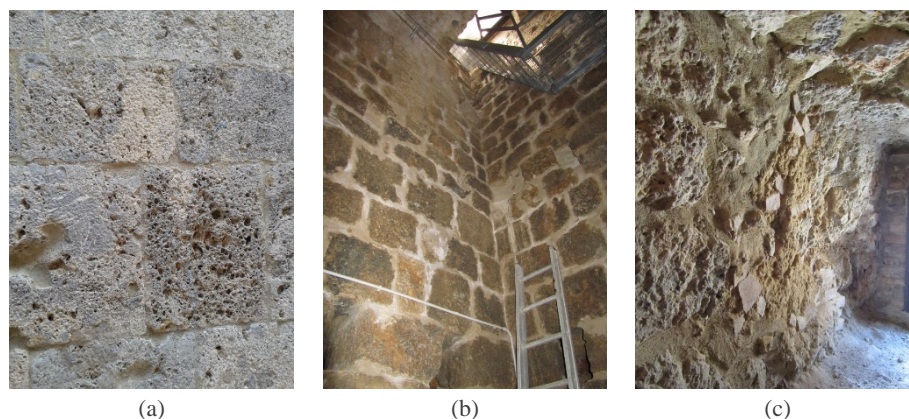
Three views on masonry wall of the Collegiata tower (#3): a) external and b) internal faces, c) inner part.
